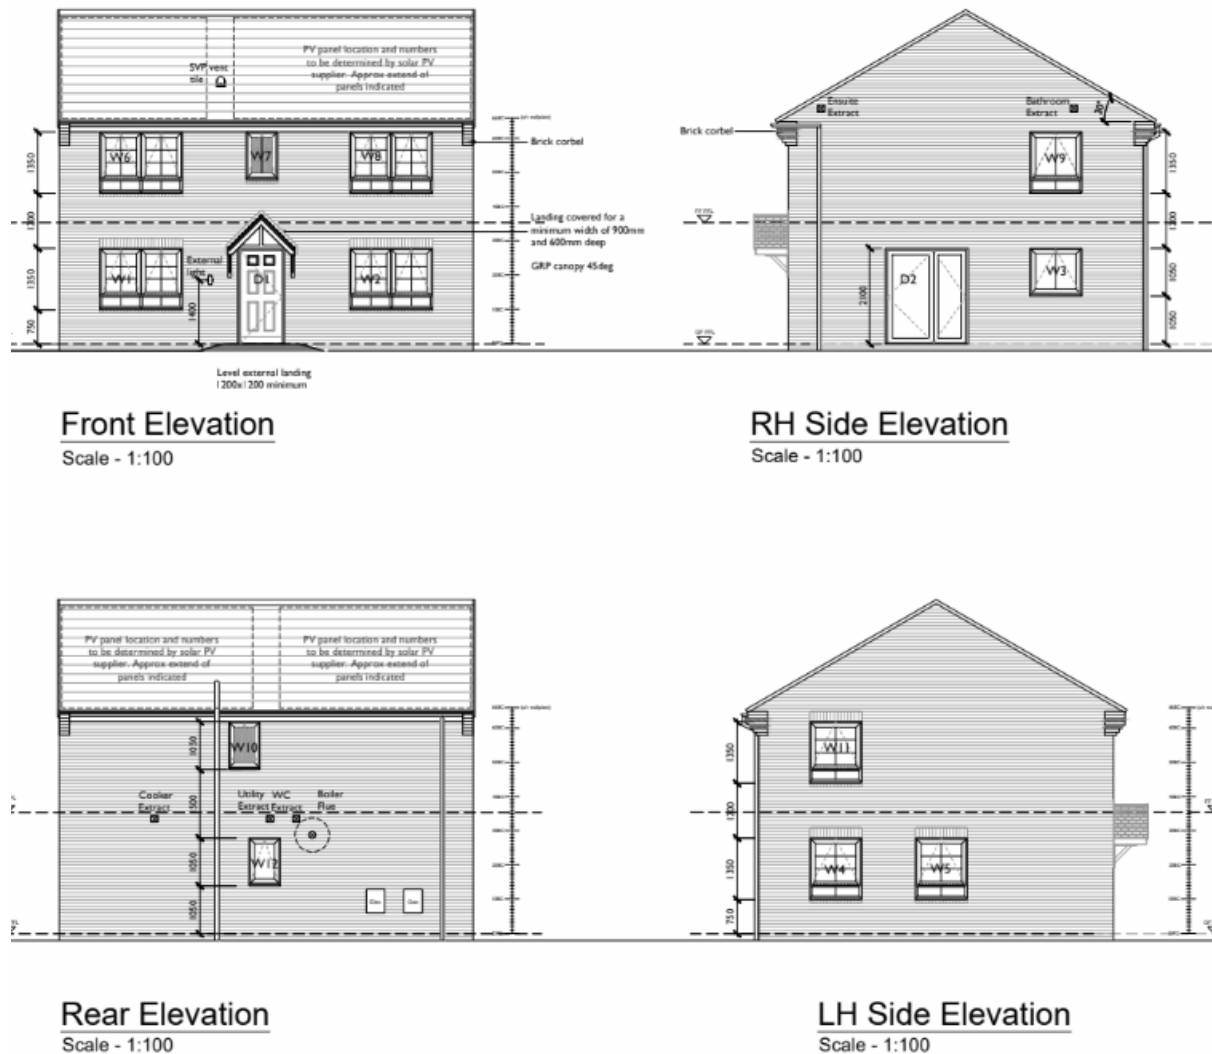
Elevations (Mirrored) provided by Newett Homes showing the window/door openings and which casements are fixed and which are open, and how eg side hung/top hung
